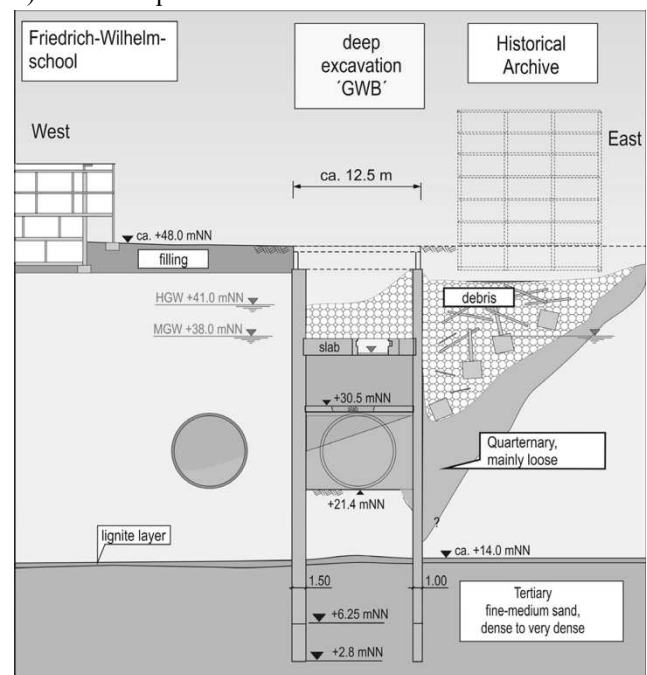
East-west section through the deep excavation ‘GWB’ with neighbouring buildings and subsoil situation (position of section corresponds to section 1-1 in Fig. 3).
